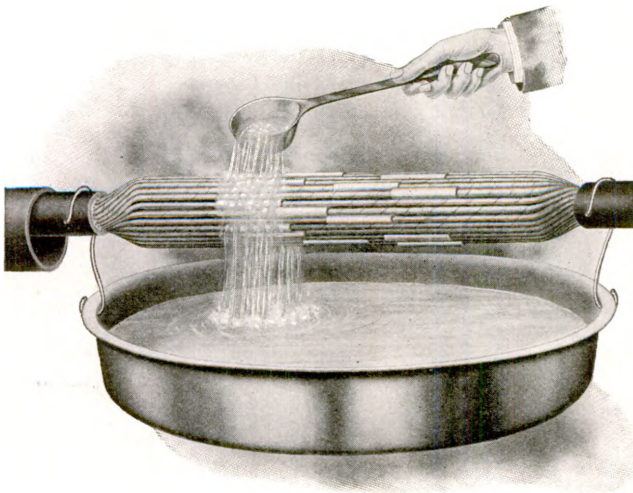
CABLE, PAPER INSULATION, SPLICING.
